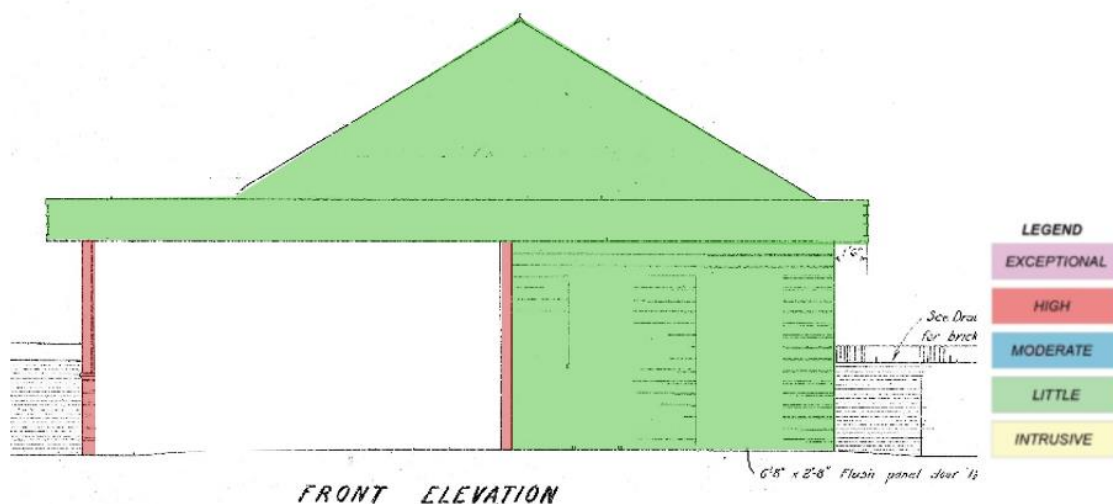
Element gradings of the side (south-western) elevation of the Denistone Station overhead booking office (Source: RailCorp in Arcilla, Gupta and Binkhorst 2019. p. 17, additional assessment by Artefact 2021)
